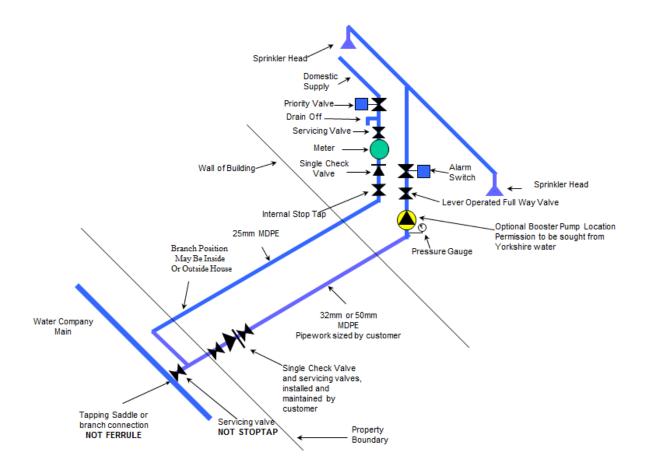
New House With Storage & Boosted Sprinkler Supply
